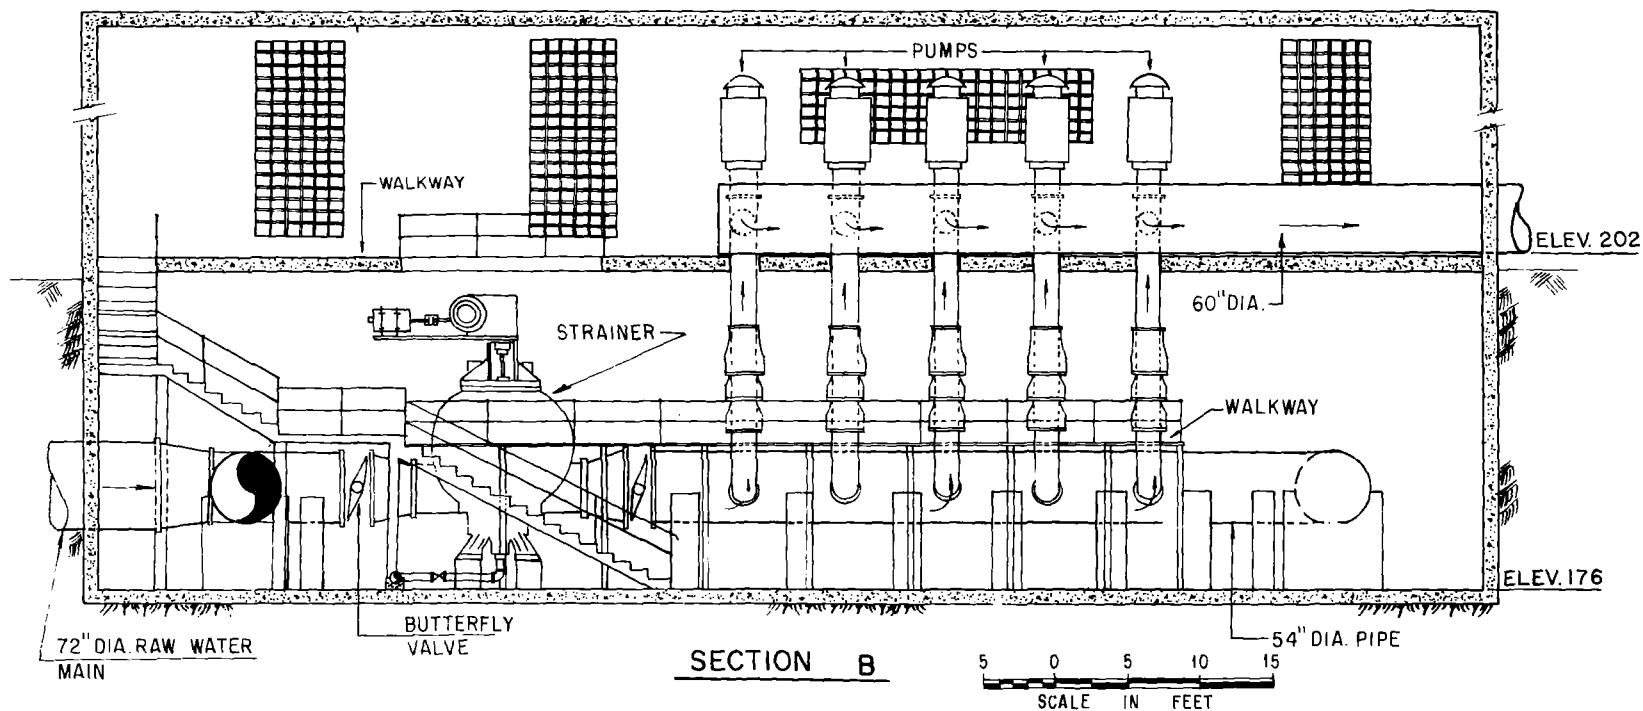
OROPOUCHE RAW-WATER PUMP STATION — SECTION
